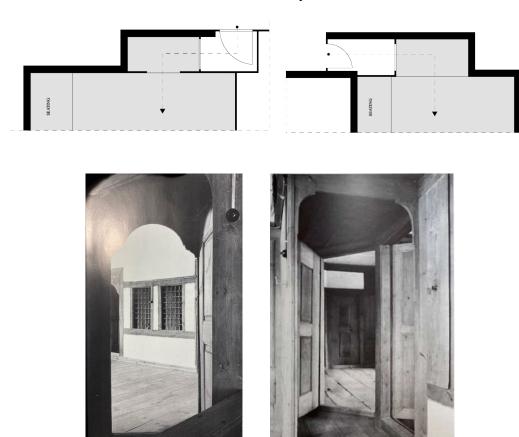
Hacı Salih Paşa Summer House - Top Floor Room Entrances
